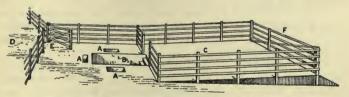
A, A, A, manholes; B, bath; C, drainer; D, sheep-pen; E, inlet gate; F, outlet gate.
